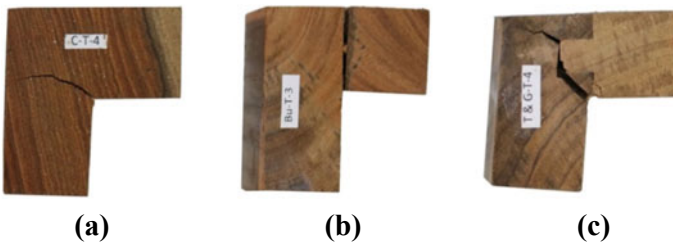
Failure modes of shear test in teak a clear; b butt; c tongue and groove
